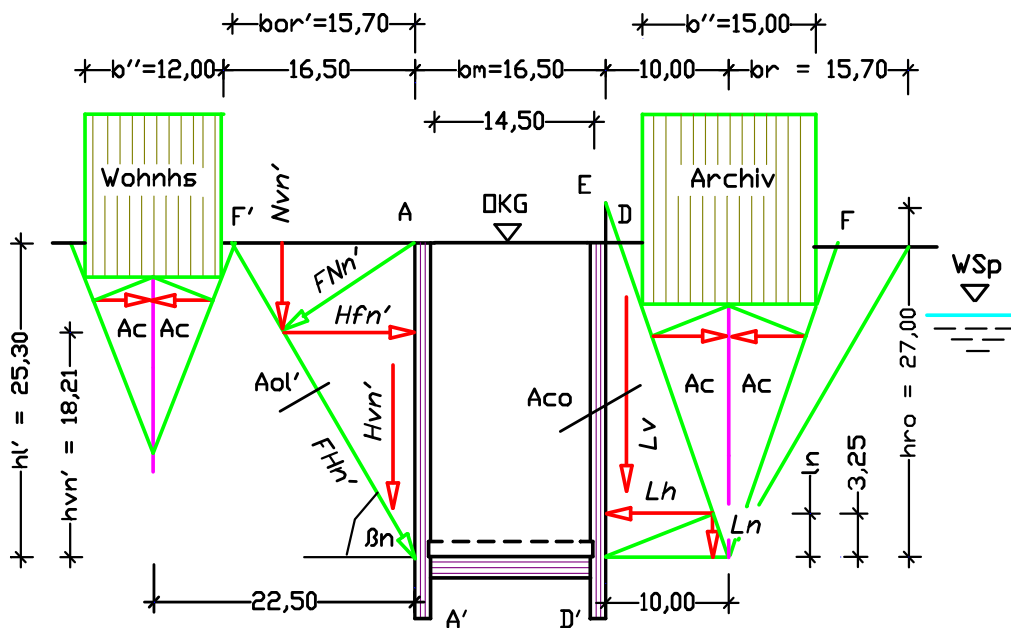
Load areas at left and right of the tunnel, which are used for dimensioning the slotted walls.
